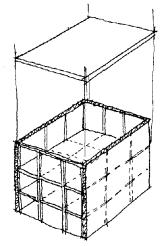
Figure V-ll. Solution #1: Frame structure with entire perimeter of approximately equal strength and stiffness. Solid walls should be of non-structural cladding.
